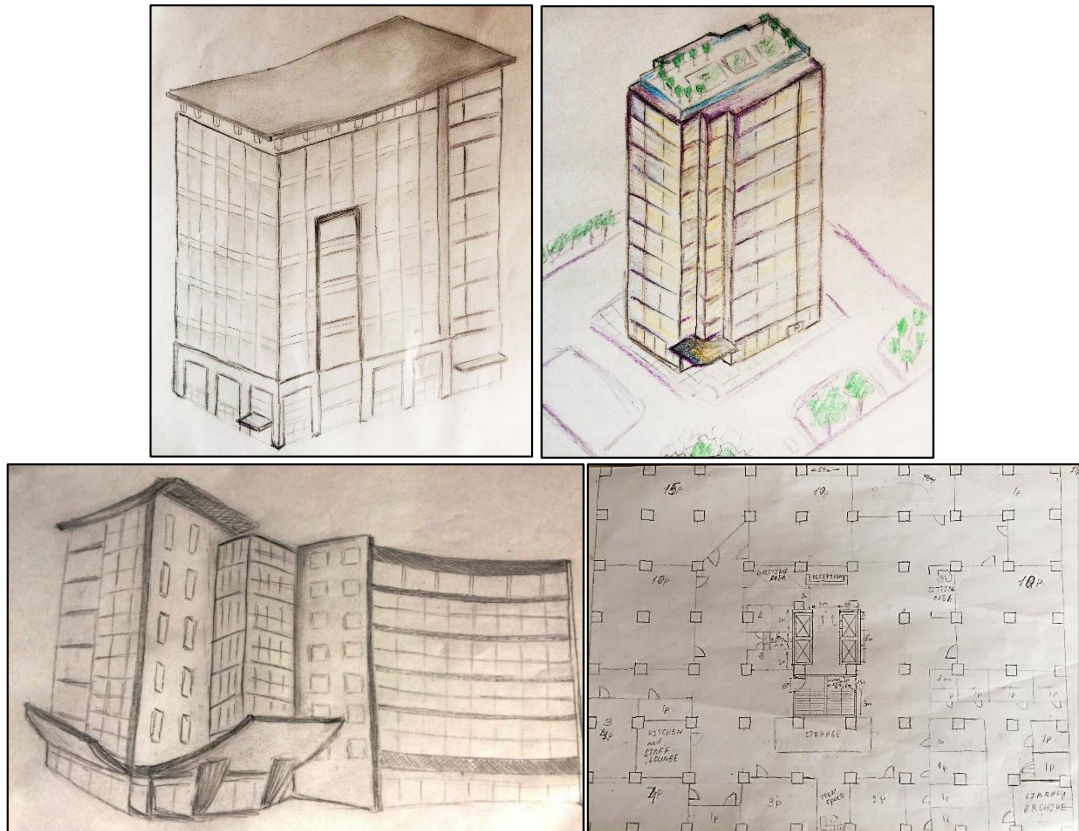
Sketches of global design alternatives and typical floor plan development.
